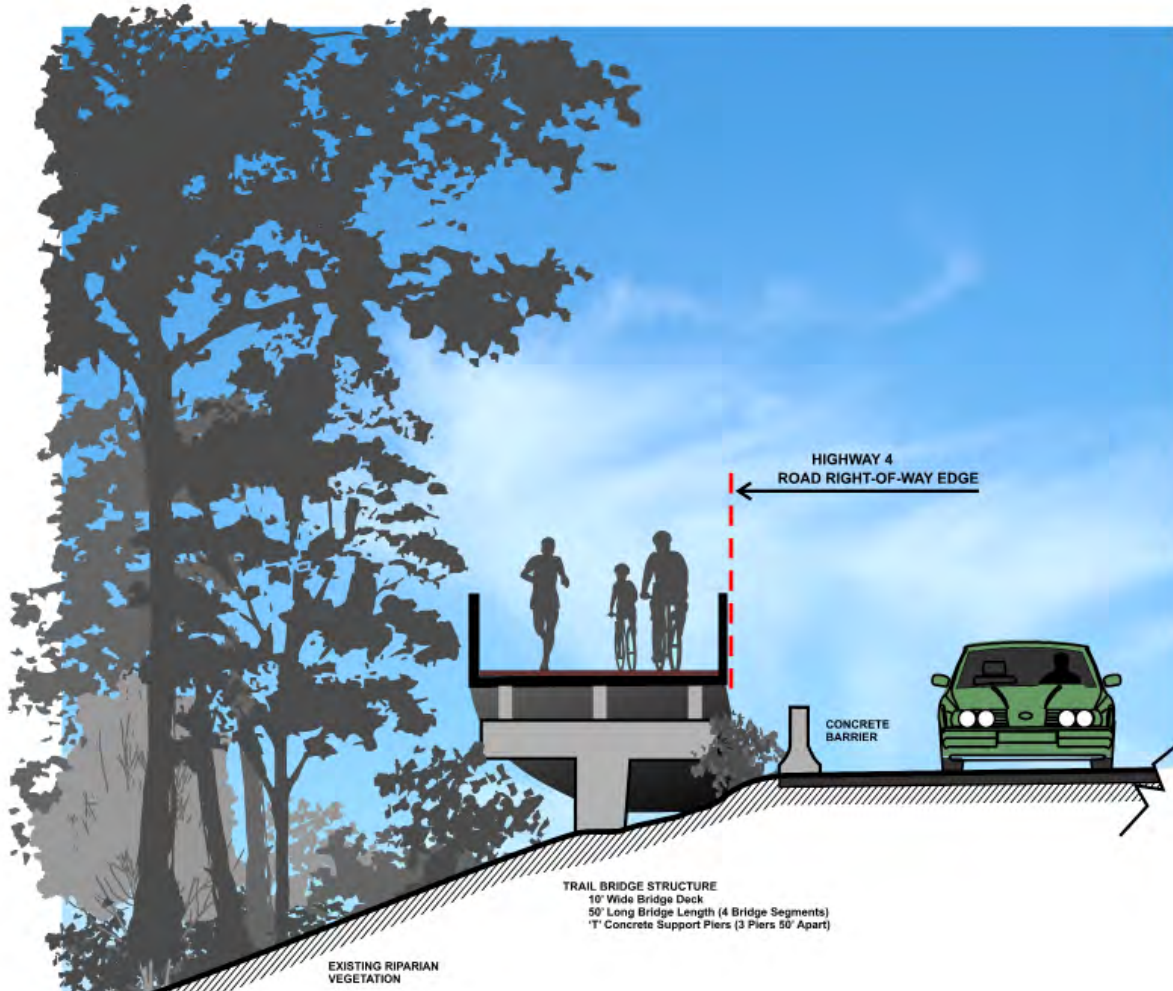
D: Type A Trail (Trail Bridge Structure Adjacent to Hwy 4)
